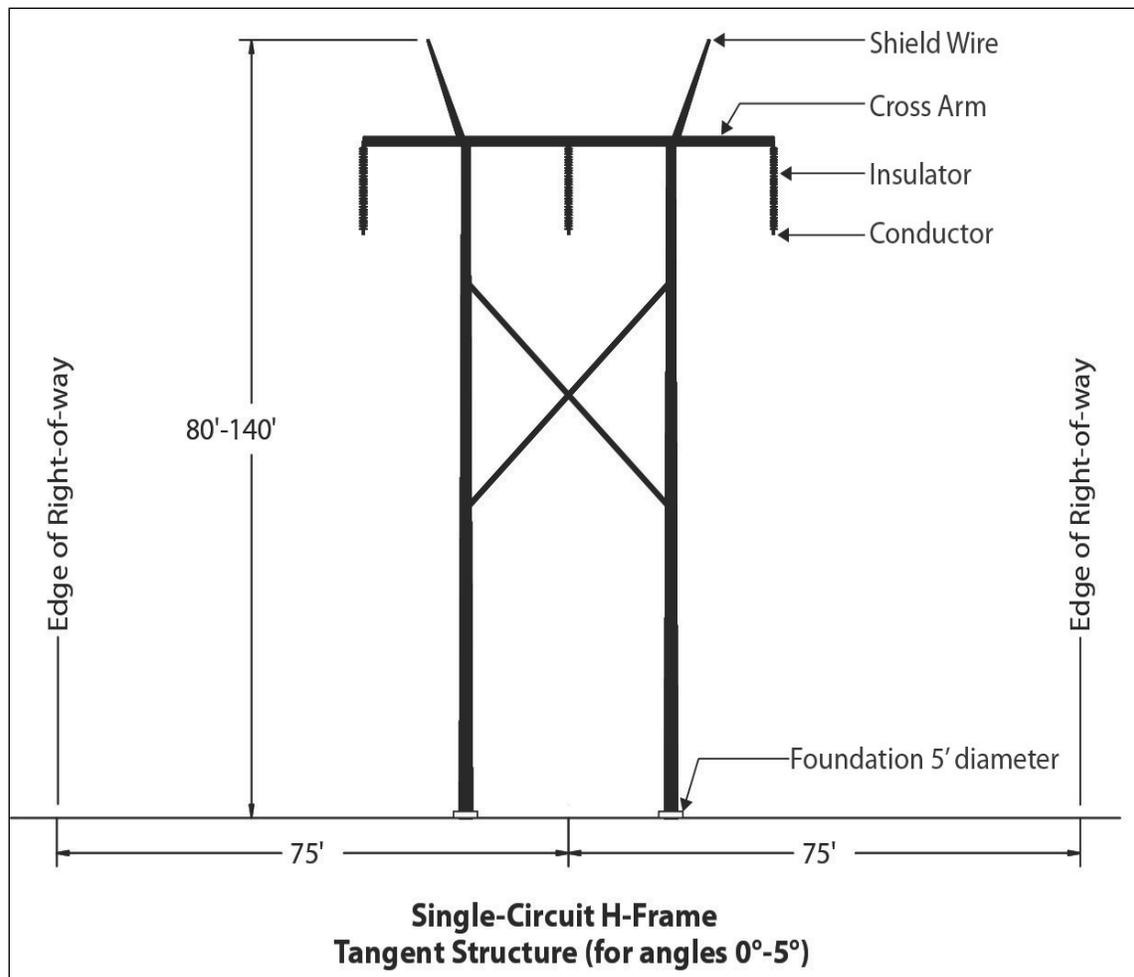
Proposed Tangent Single-circuit 345-kilovolt H-frame Structure
